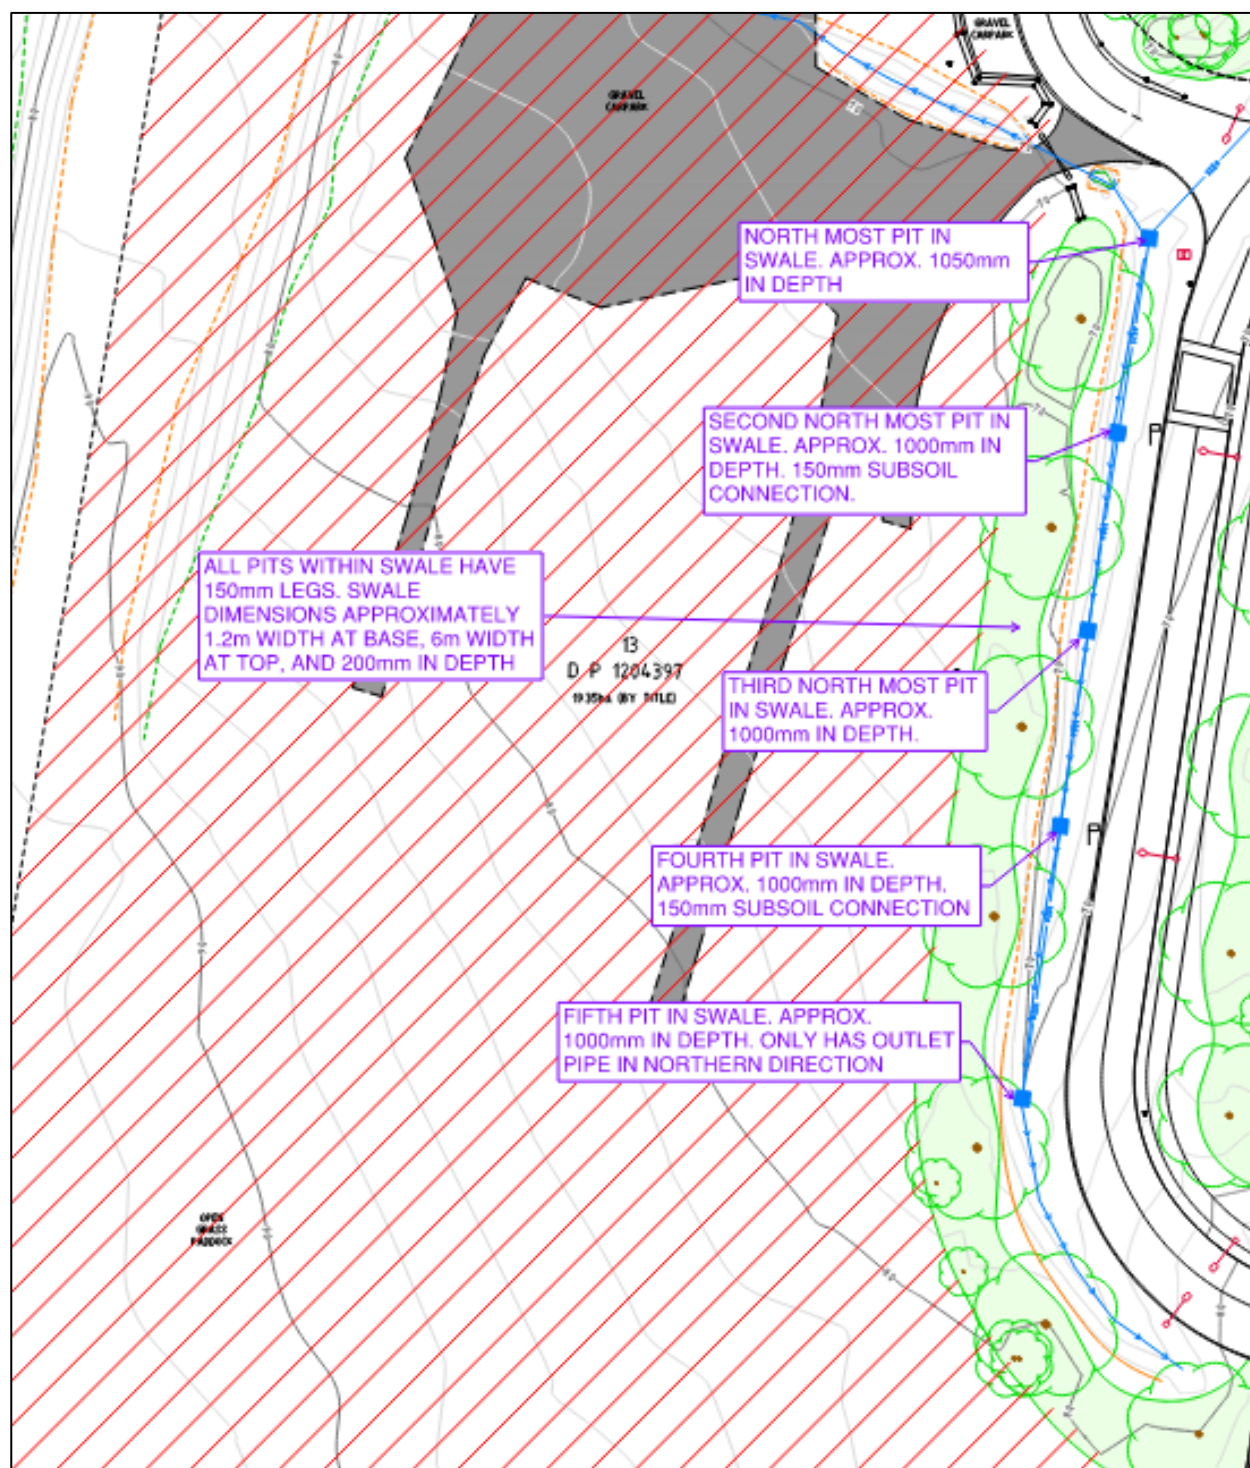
Existing Site Stormwater Network (Source: Beveridge Williams 2023)
